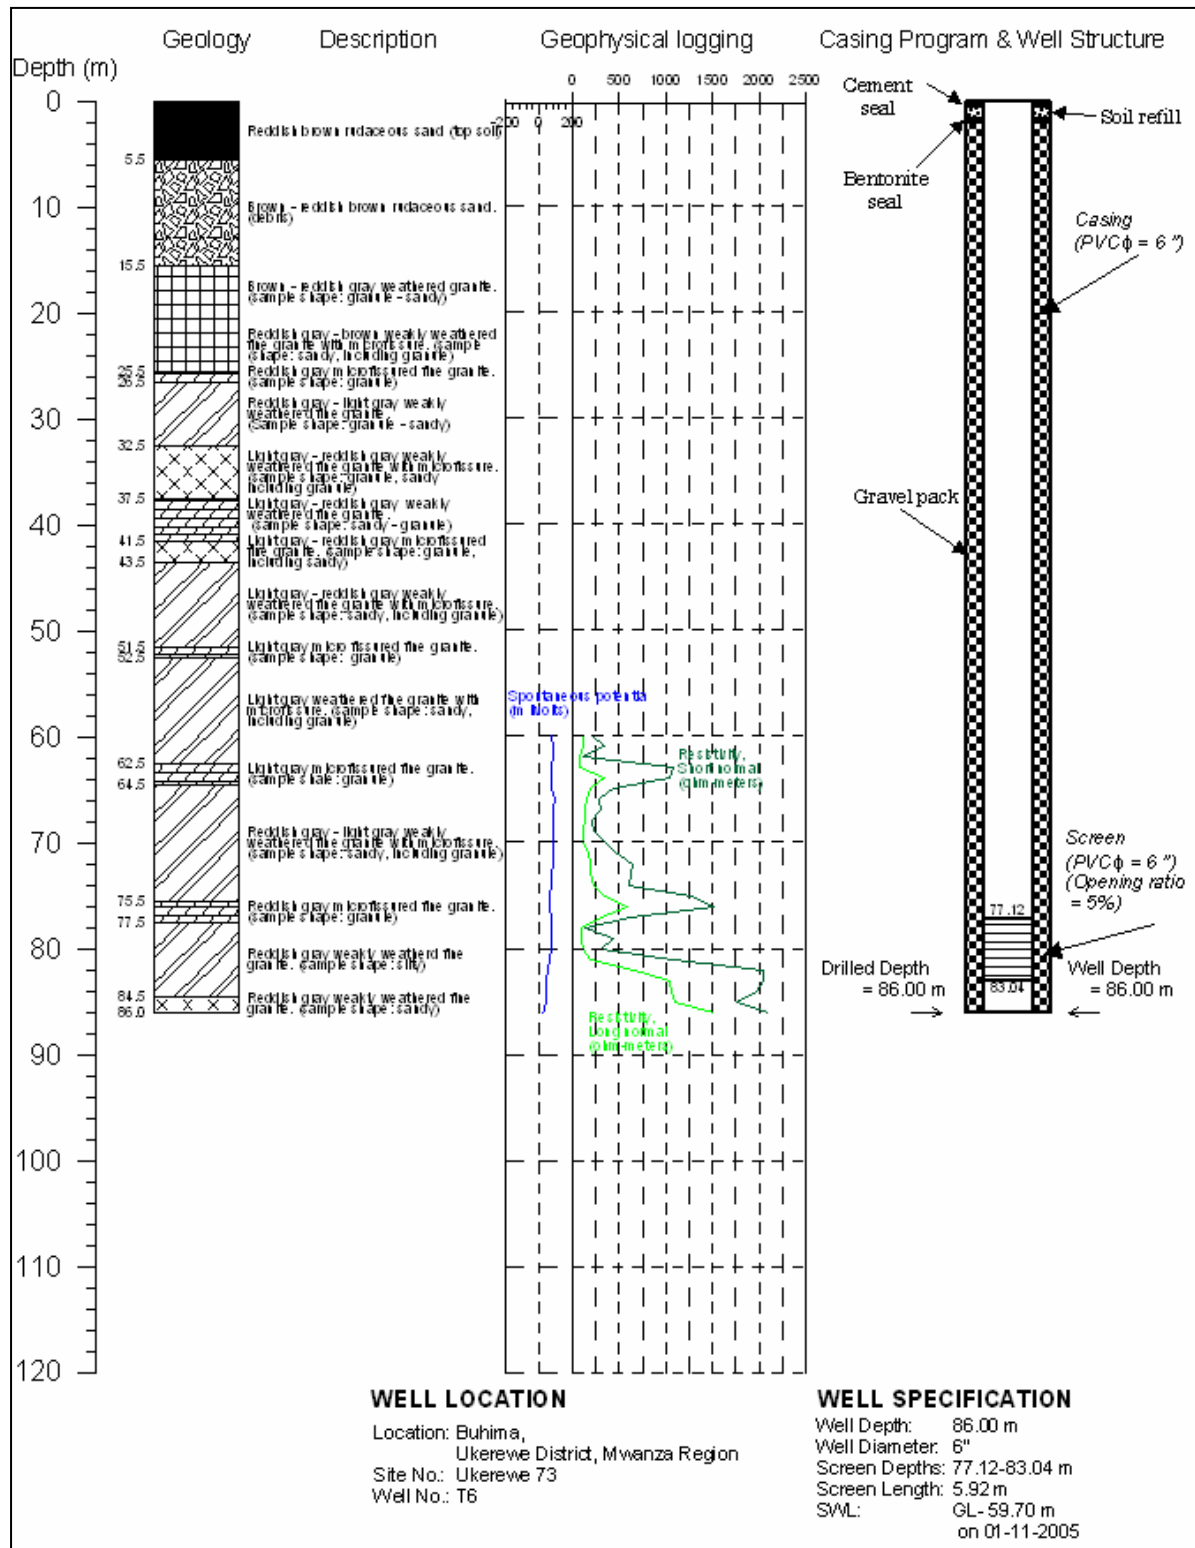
Columnar and Section and Well Structure (Buhima)
